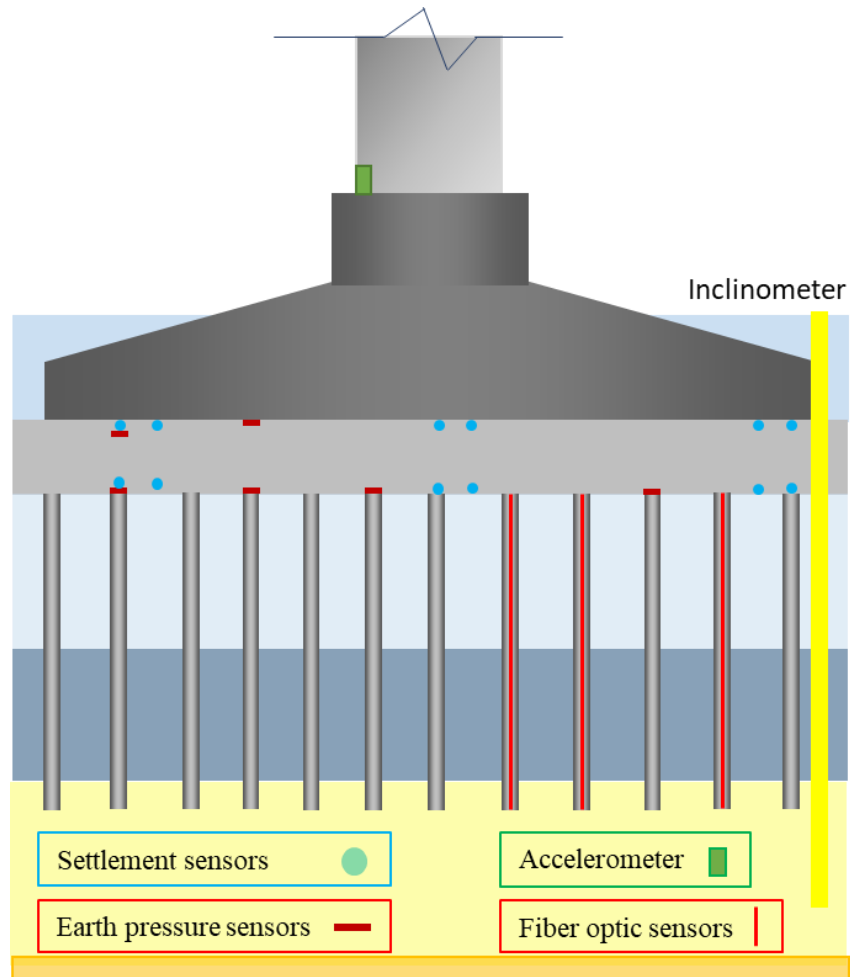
Elevation section showing the positions of the instruments used in this study.
